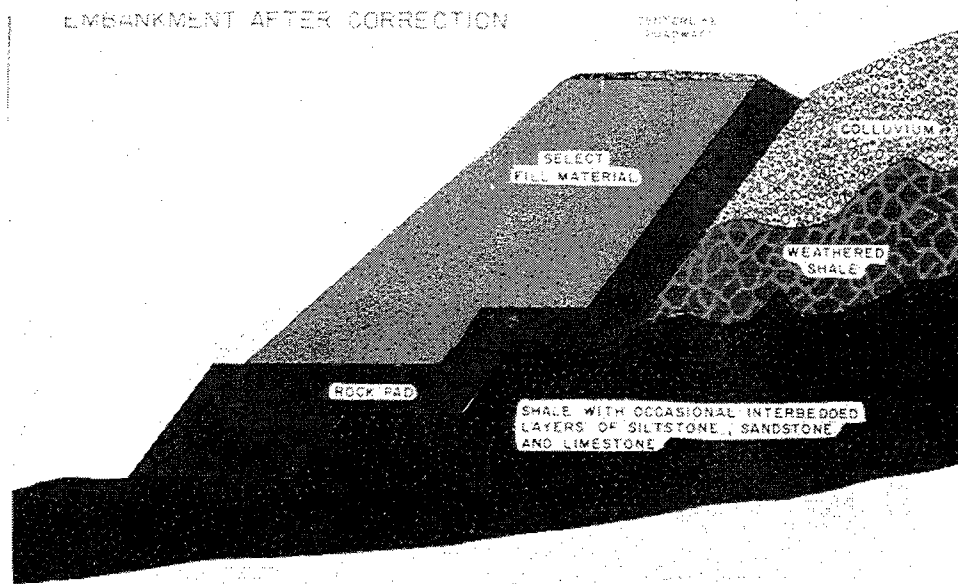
Schematic Drawing Illustrating Underbenching Concept with Rock Pad and Engineered Roadway Embankment.
